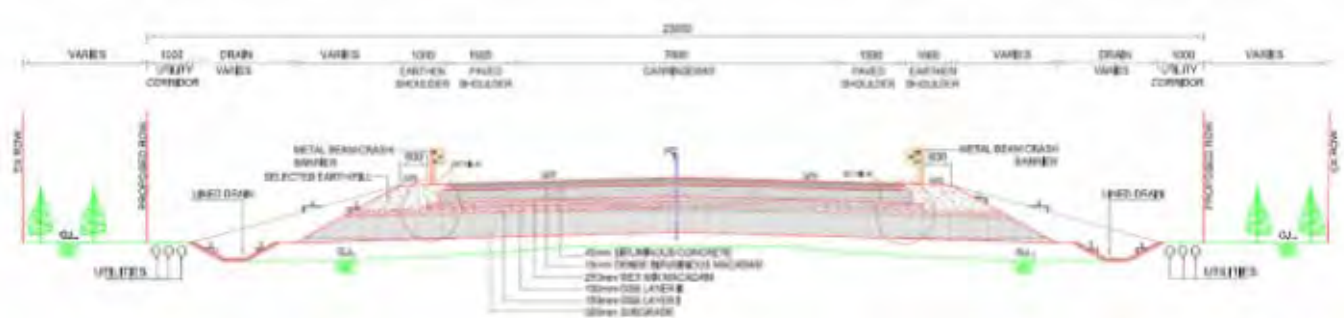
C5 – R-N- Two Lane Carriageway with Paved Shoulder in Realignment Area
